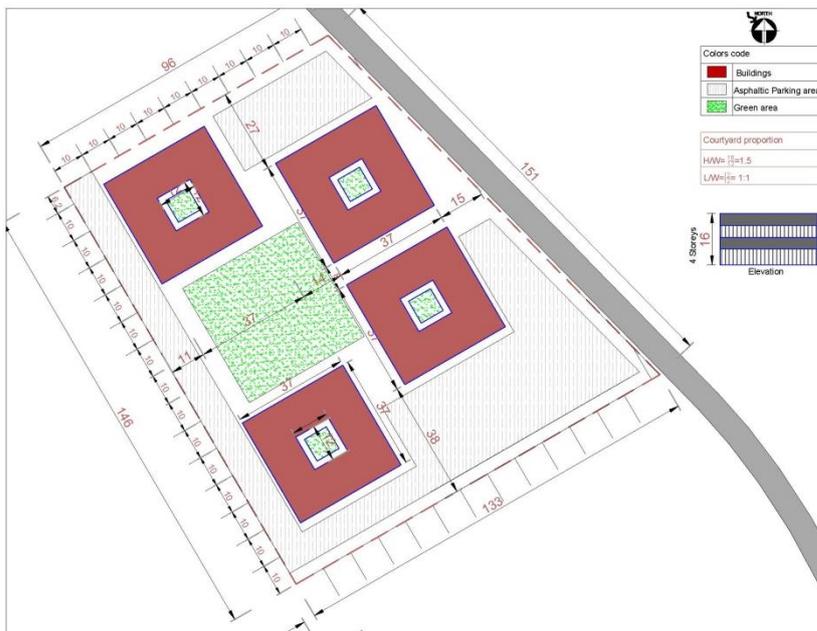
The proposed fortress blocks and square courtyard urban configuration layout of Plan B
